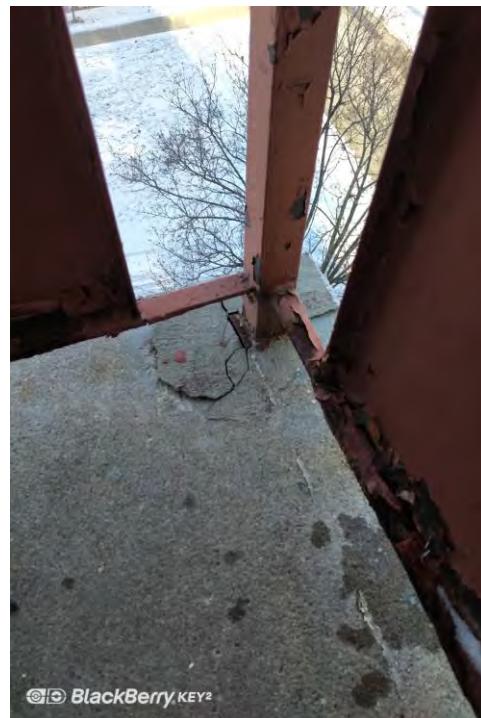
Typical concrete delaminations at balcony slabs edges
